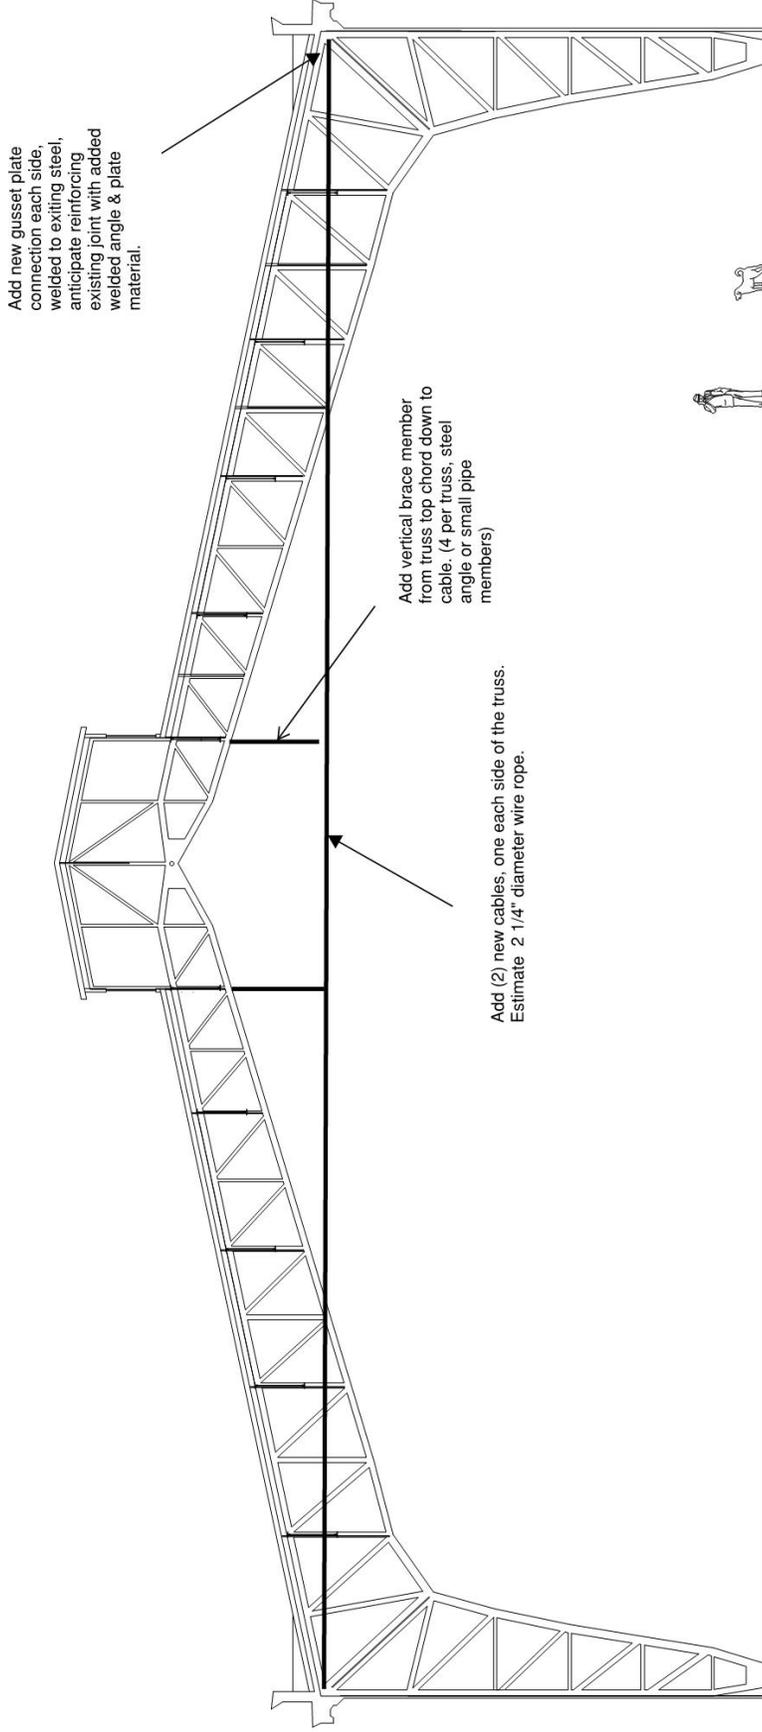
Building Cross Section, Reconstructed Center Pin Seismic Improvement
